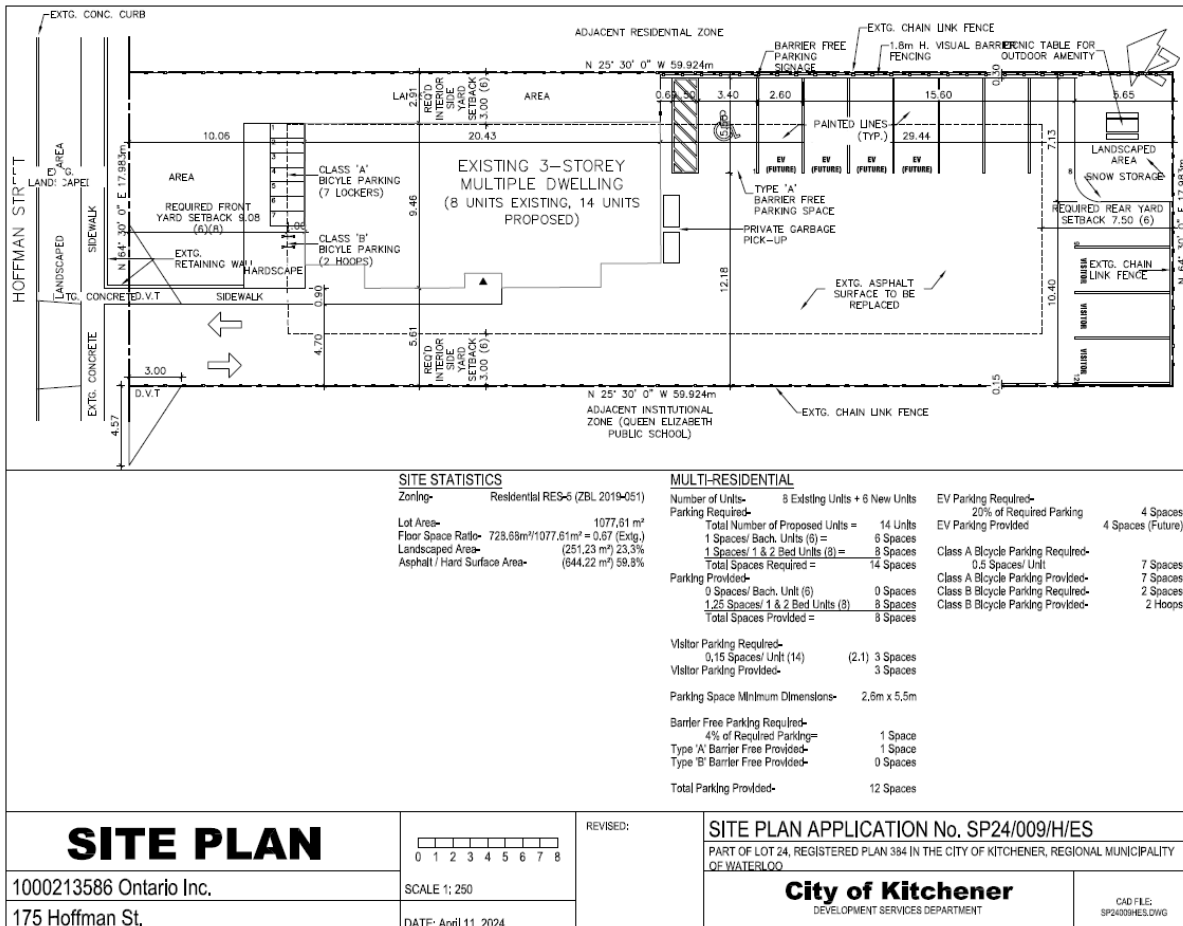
Conditionally Approved Site Plan SP24/009/H/ES
